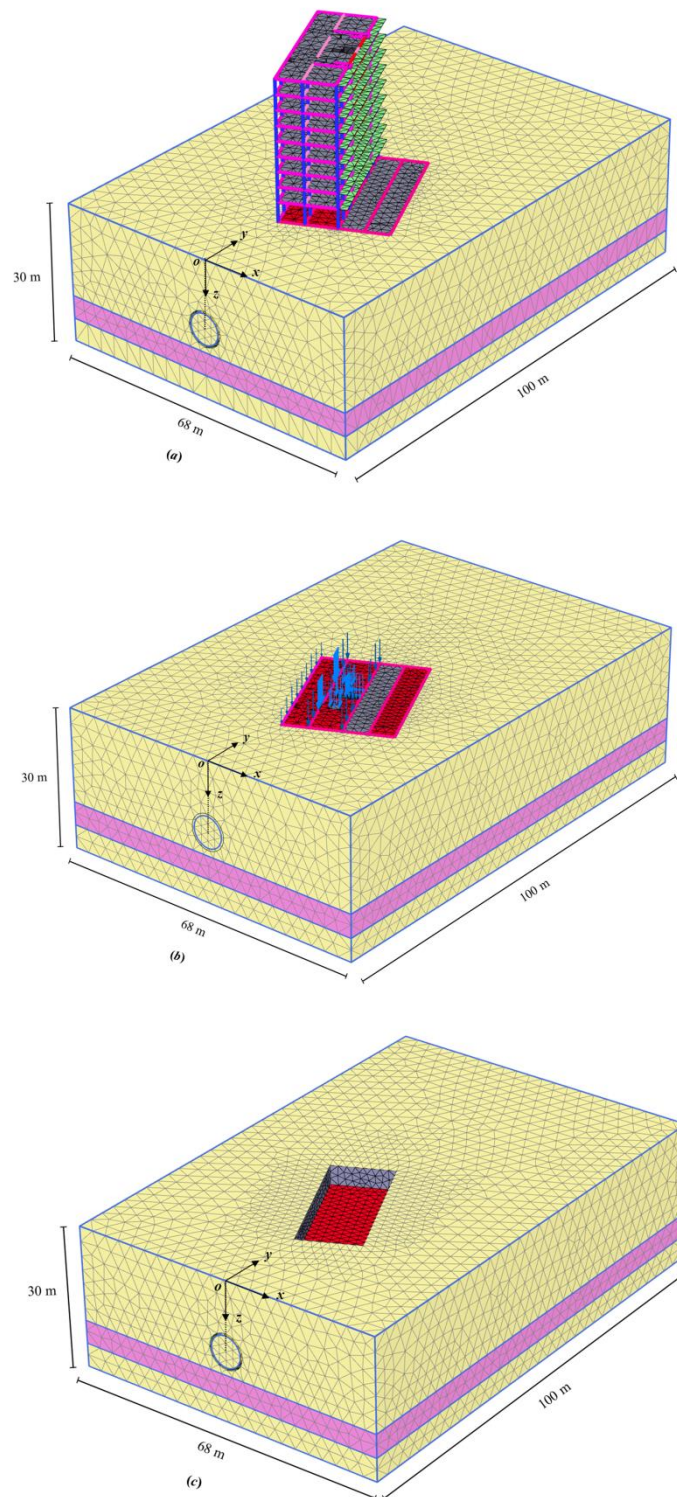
Sketch of the finite element models with simplified structural schemes: building without cross-bracings (a); building reduced to its buried portion (b); building reduced to an equivalent plate (c).
